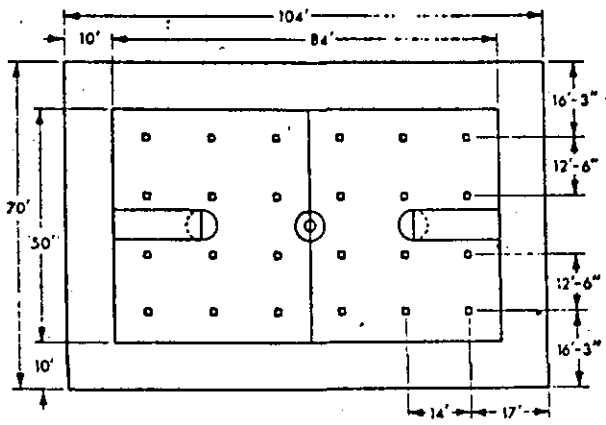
Lighting layout for an indoor basketball court. A distance of 10 feet (3.0 meters) between court boundary and wall is recommended. Minimum luminaire mounting height should be 22 feet (6.7 meters).
